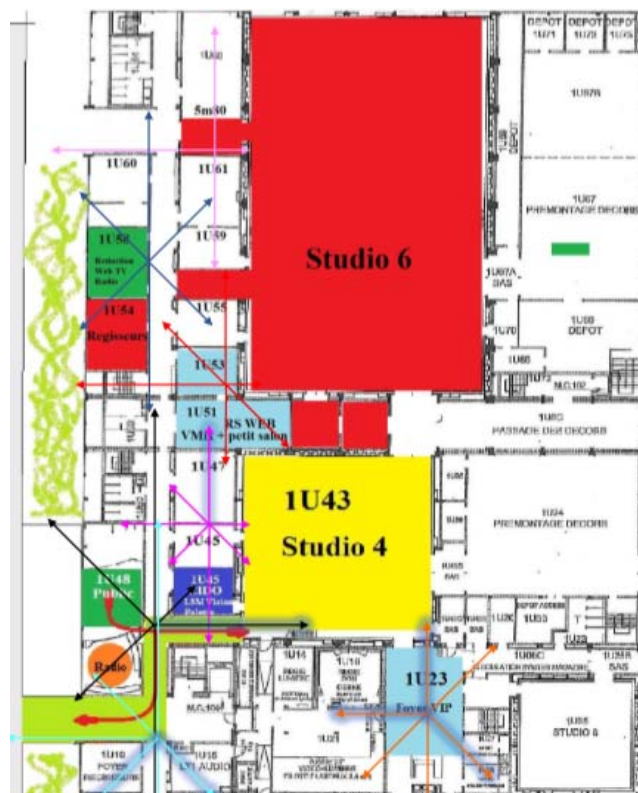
Design at 2.4 GHz for Floor 1 Television Studio in Building CHJM
